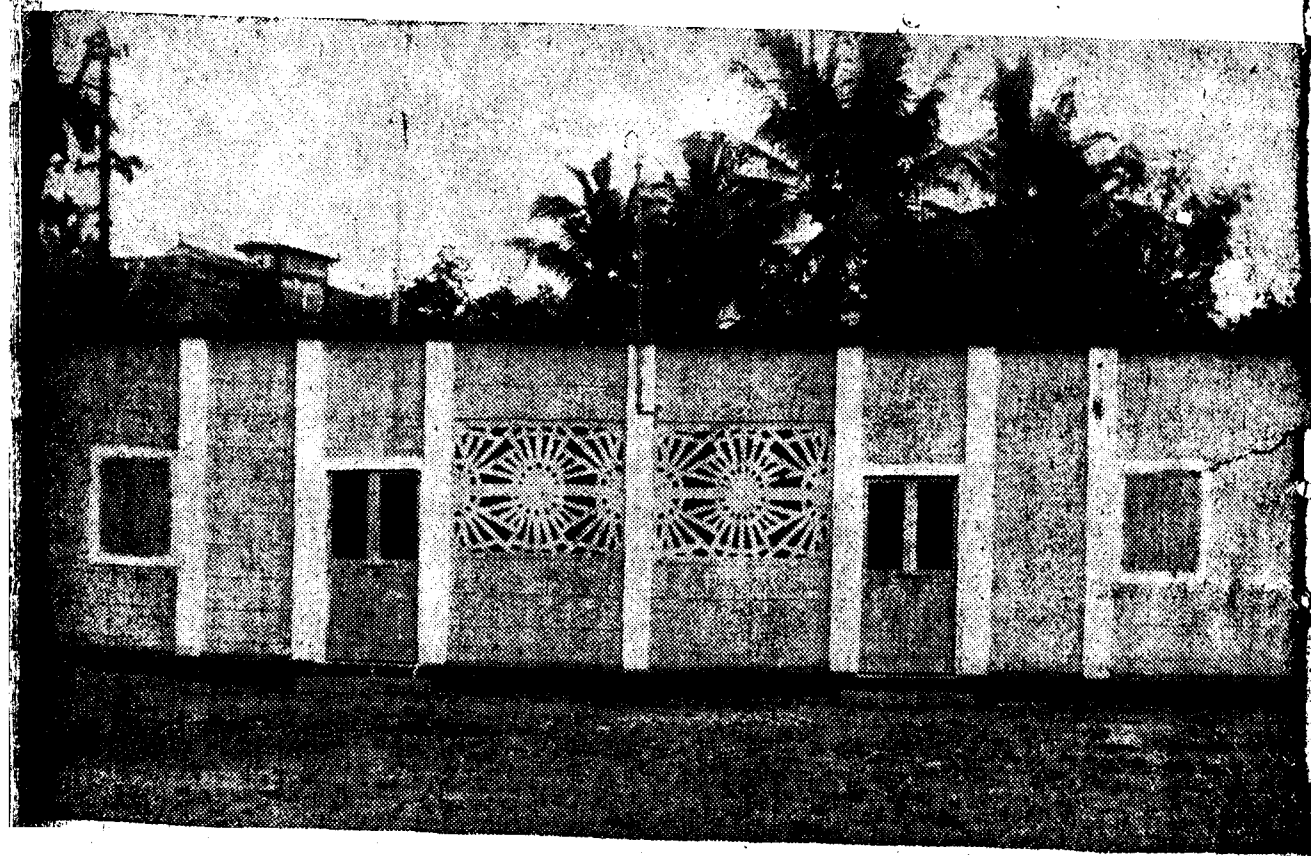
Prefabricated, single wall, single floor, flat roof, GUNITITE HOUSE at Vile Parle, Bombay.
